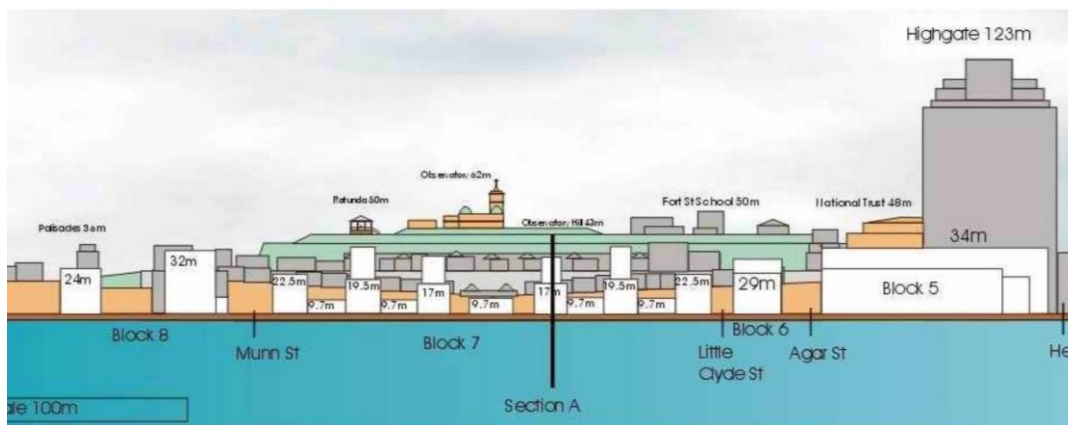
ACTUAL DIMENSIONS OF THE BUILT FORM OF CENTRAL BARANGAROO BARANGAROO MASTERPLAN BLOCK ENVELOPES WEST ELEVATION
